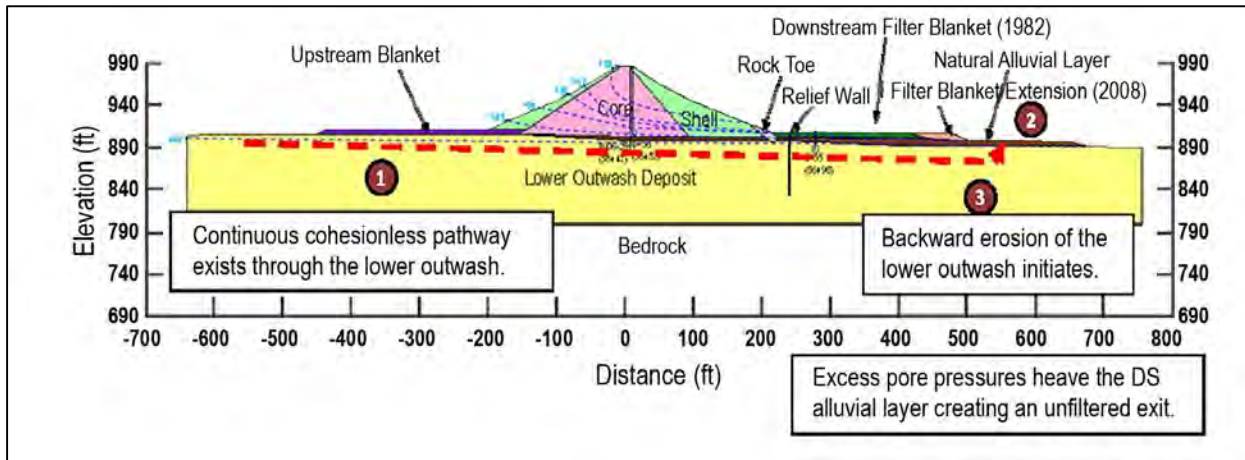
Example PFM: Stages 1, 2, and 3 of a “through foundation” failure mode.
